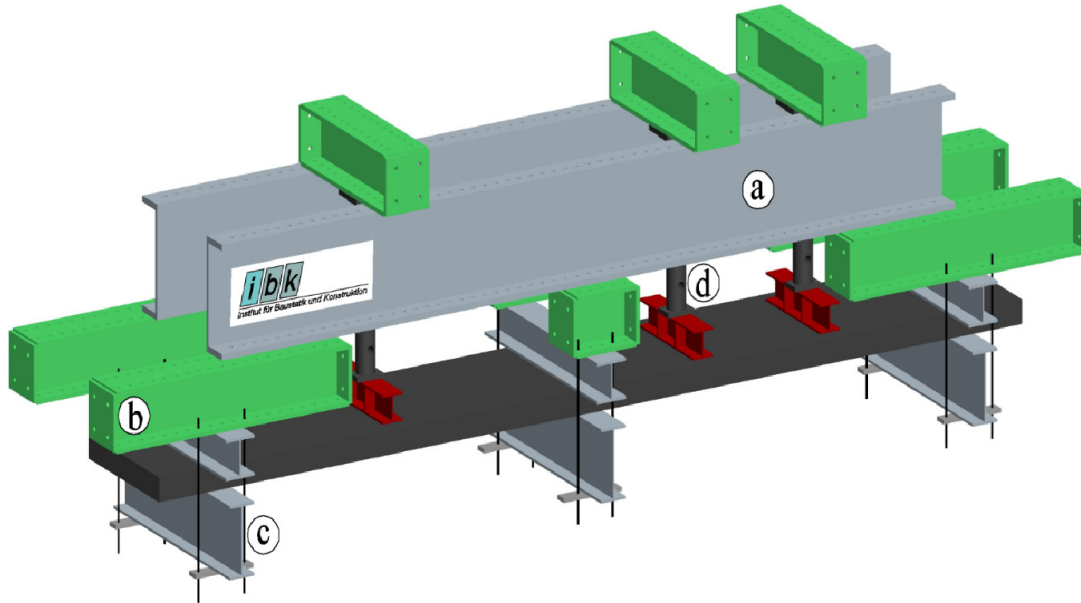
Testing frame (a: U-profiles, b: HEB sections, c: IPE 360 secondary beams with tension rods, d: load jacks).
